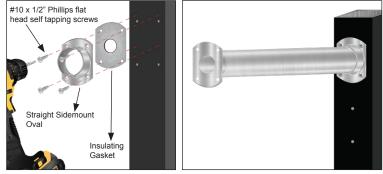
Figure F. (LEFT) Install using four (4) #10 x 1/2" Phillips flat head self tapping screws.
